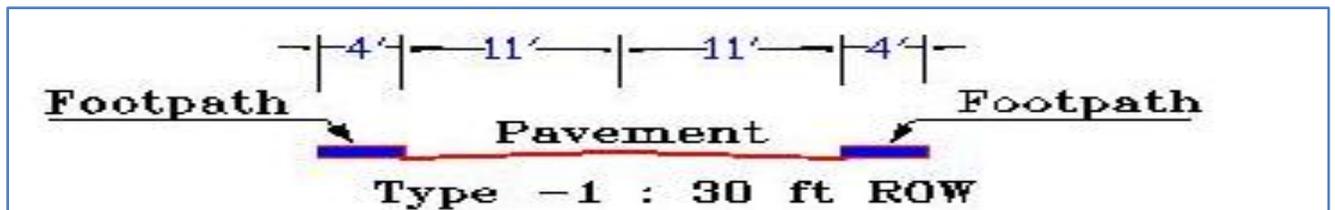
Standard Cross-Section of Tertiary Road/ Local Road
